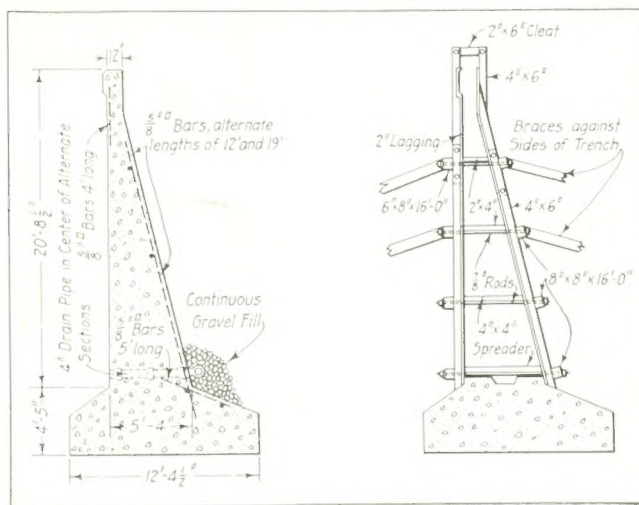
SECTIONS OF WALL AND FORMS FOR CONCRETE.
